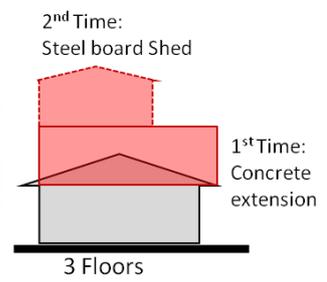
Case of addition on existing house in Liulangzhuang, Beijing
